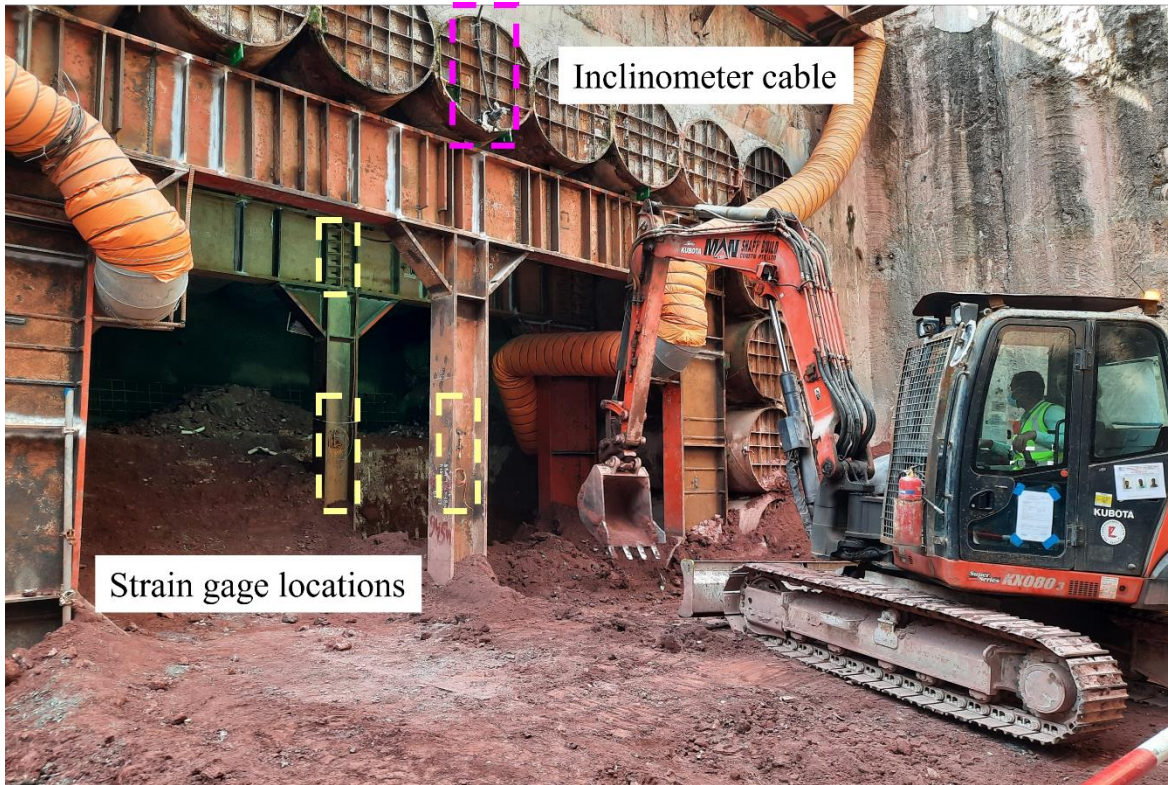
Site photo of instrumentation monitoring for steel pipe (roof) and steel frame members.
